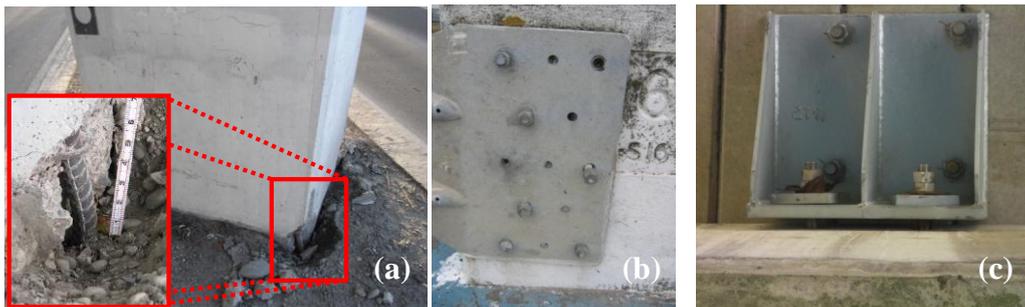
Port Hills Overbridge. (a) Buckling of reinforcing steel at the base of the piers [Courtesy of OPUS]; (b) Pop out of the bolts of the guardrail [Courtesy of OPUS]; (c) Elongation of the links between the spans [Courtesy of OPUS].
